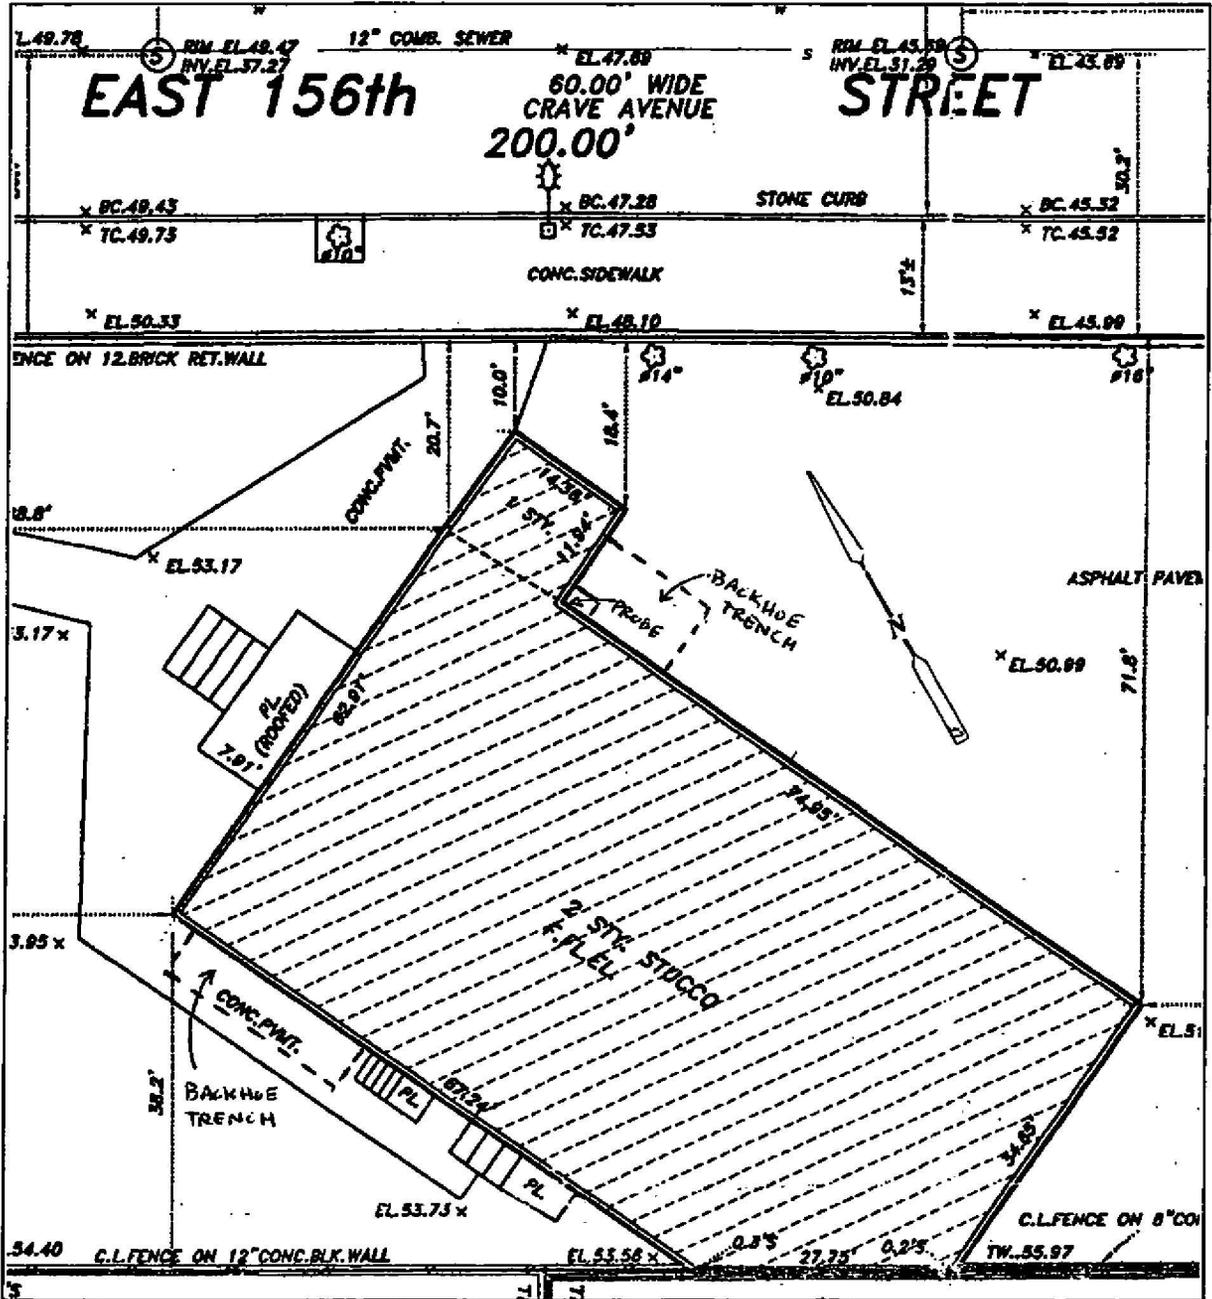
Plan of the building at 745 Fox Street showing the location of the backhoe trenches and the probe.
